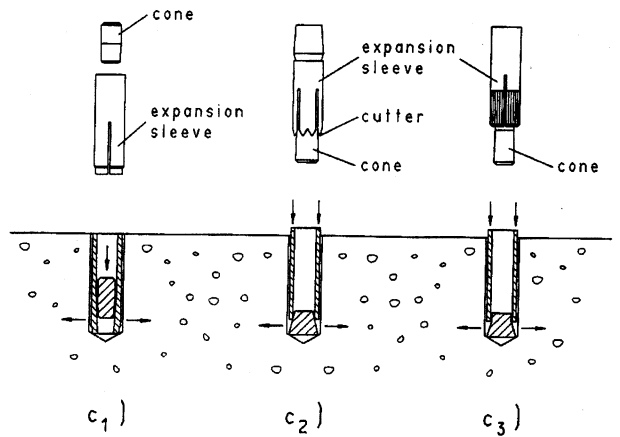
(c) — Fastening systems: deformation-controlled expansion anchor (upper sketches show assembled anchors; lower sketches show anchor mechanism actions)
